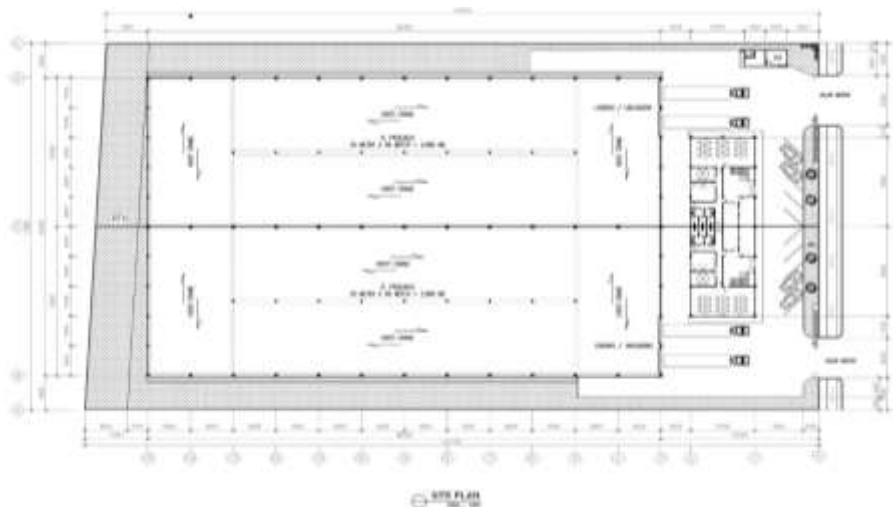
Kendal 2 Unit Warehouse Design Plan.
